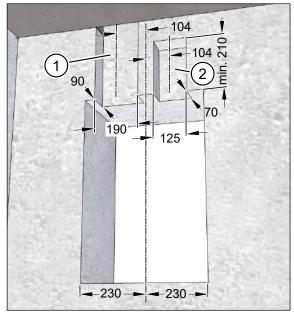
Chasing out channels for flat ductwork and flexible pipe connections, dimensions in millimetres
